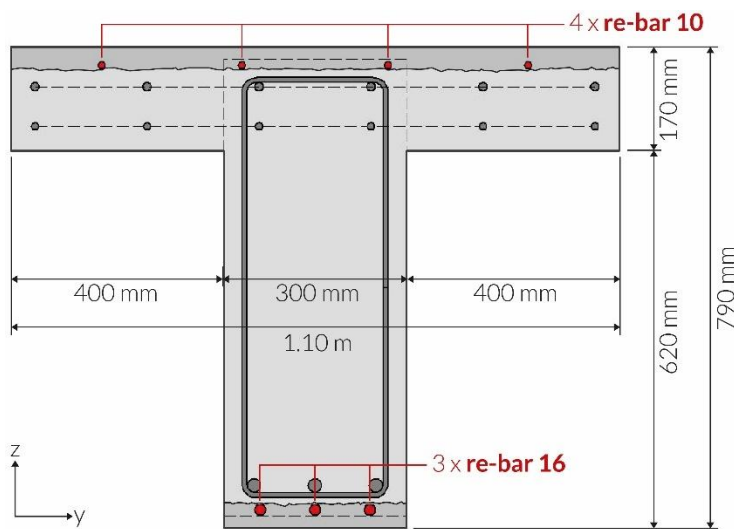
new cross-section of T-beams with re-bar flexural strengthening
